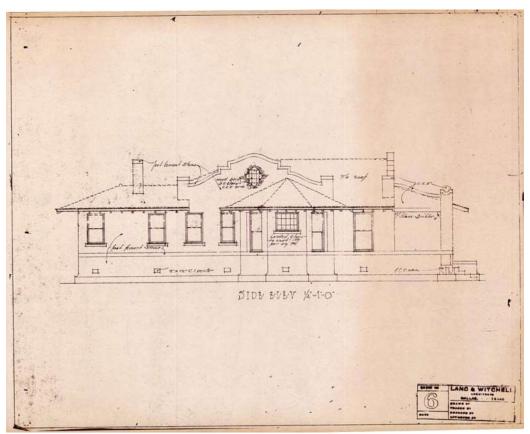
Original Lang and Witchell Side (Southwest) Elevation – Sheet 6
